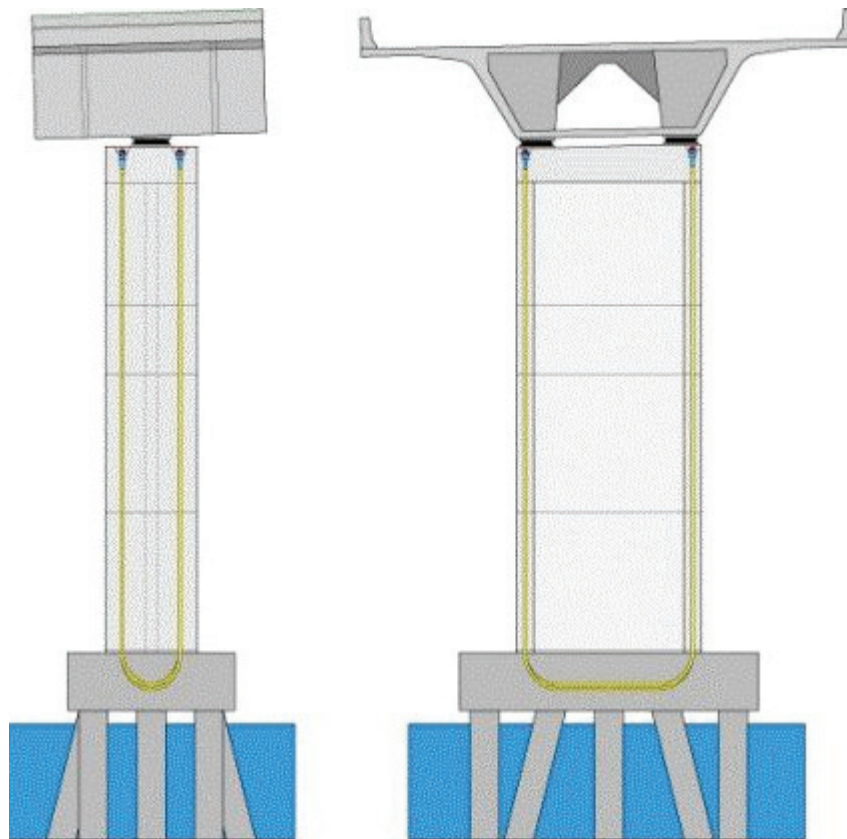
Typical precast piers with continuous strand tendons [FHWA, 2004]
